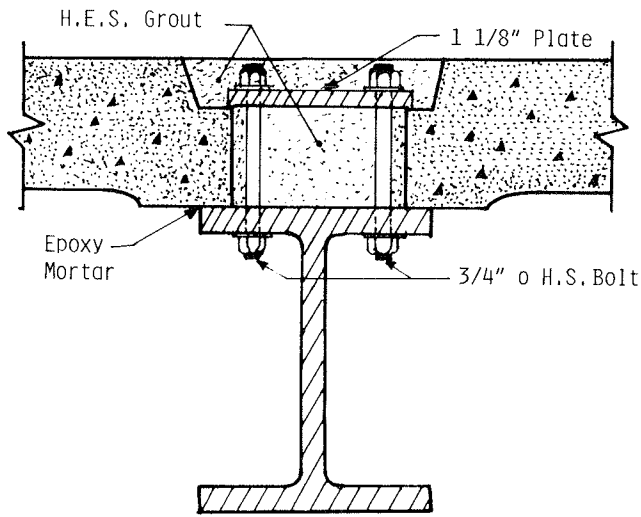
Precast deck panel steel stringer system (grouted connection).
